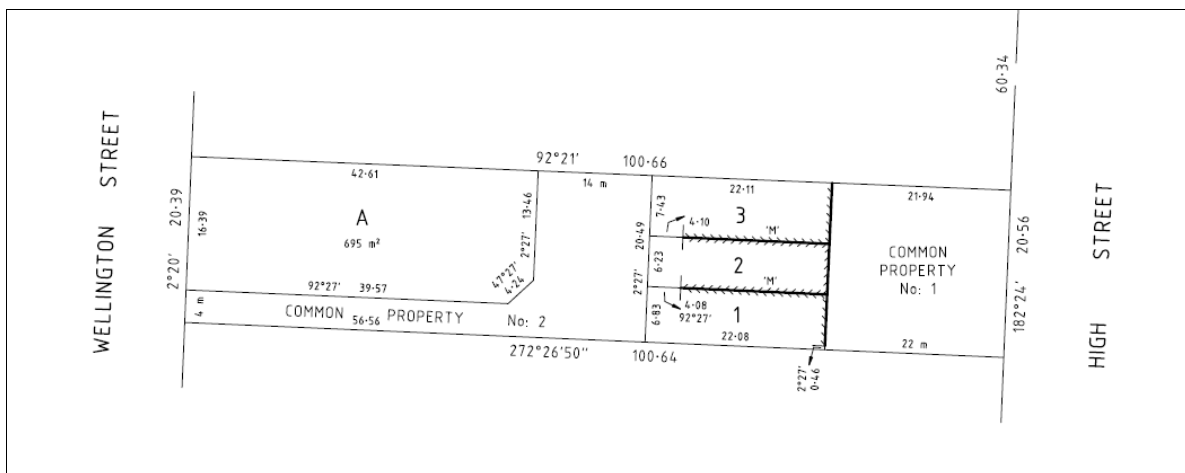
Proposed Plan of Subdivision (Supplied by permit applicant).
